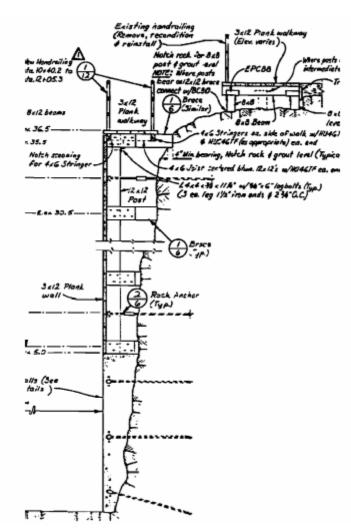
Combination of Timber and Concrete Faced Rock Cut
